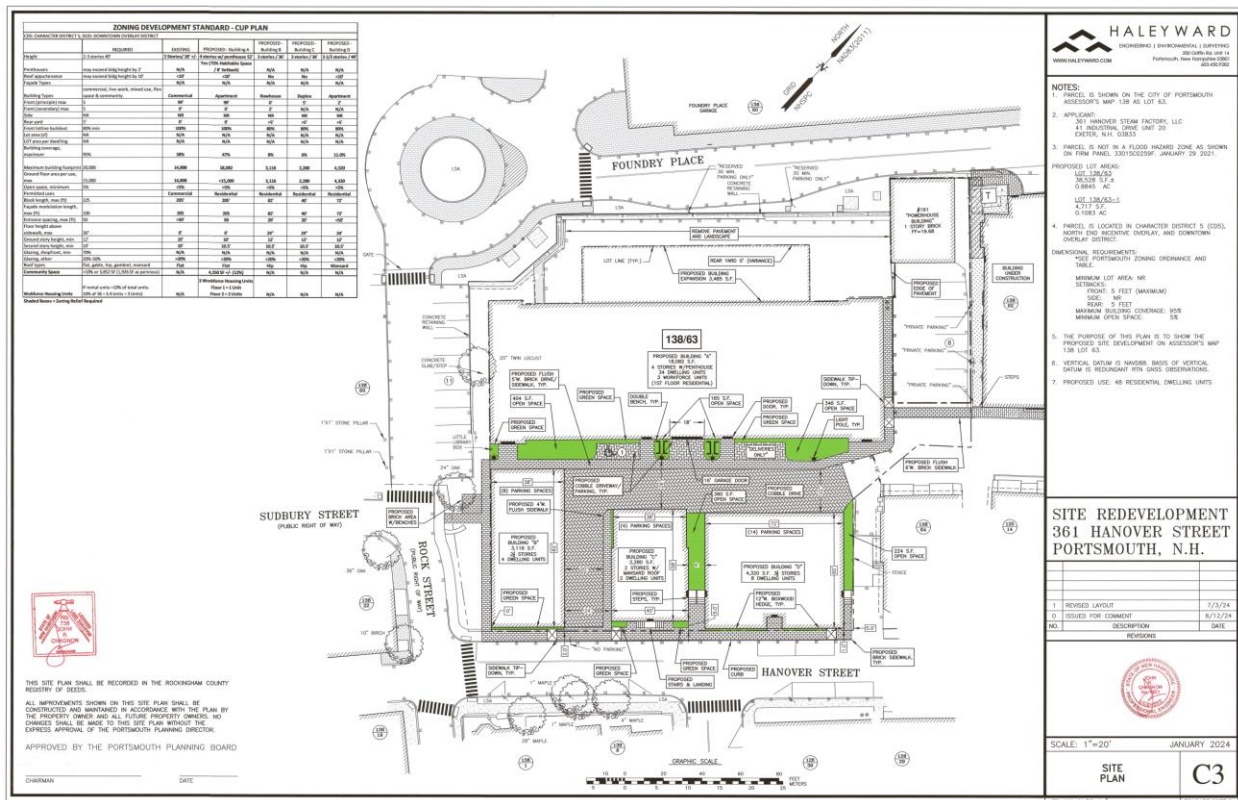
Preferred CUP Plan showing Proposed Buildings, Driveways, and Open Space
